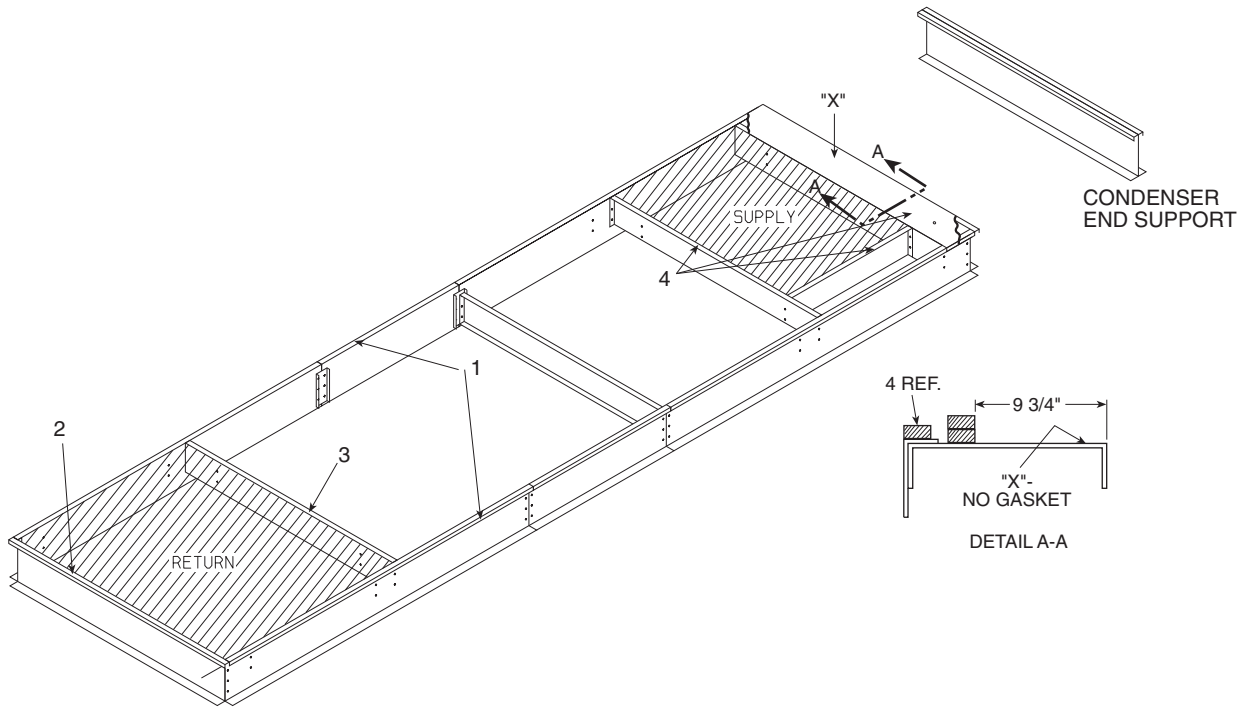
Gasket Location on Roof Curb (Size 070-100 Units)
